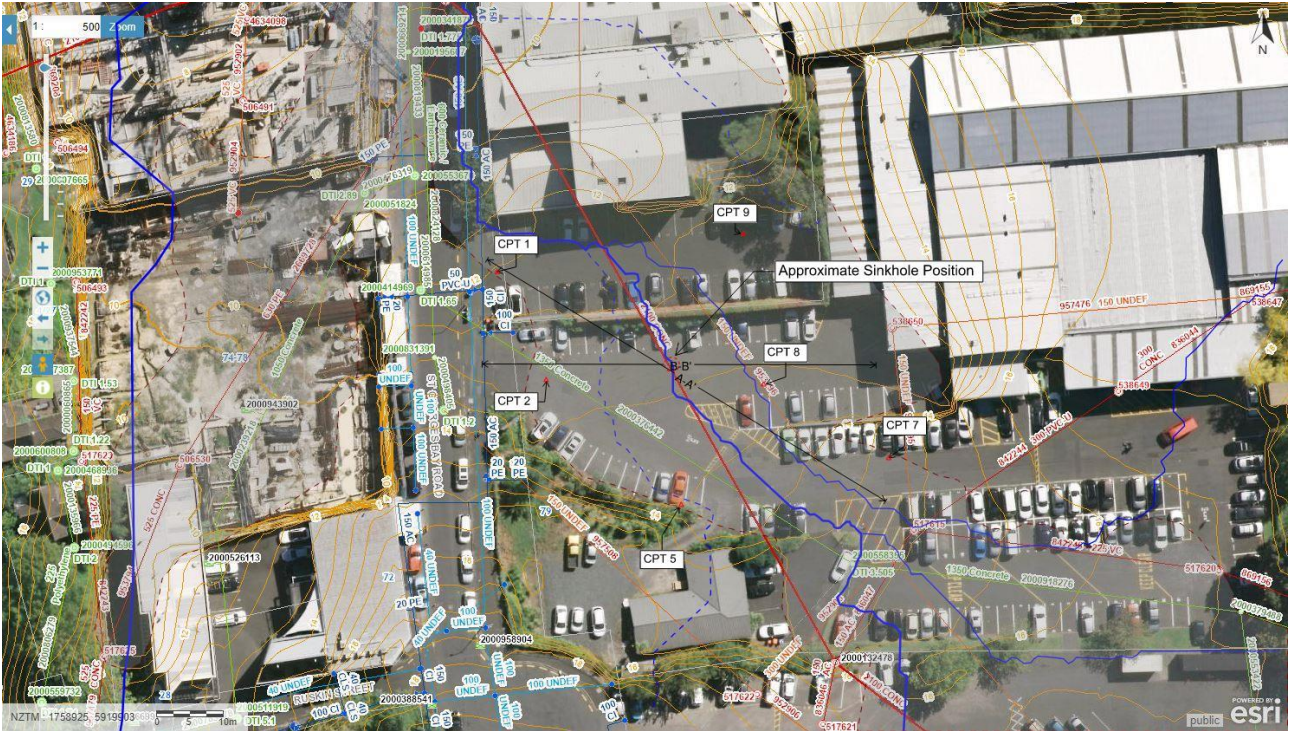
Plan of site showing sinkhole, historic streams, recent CPT's and section lines.
